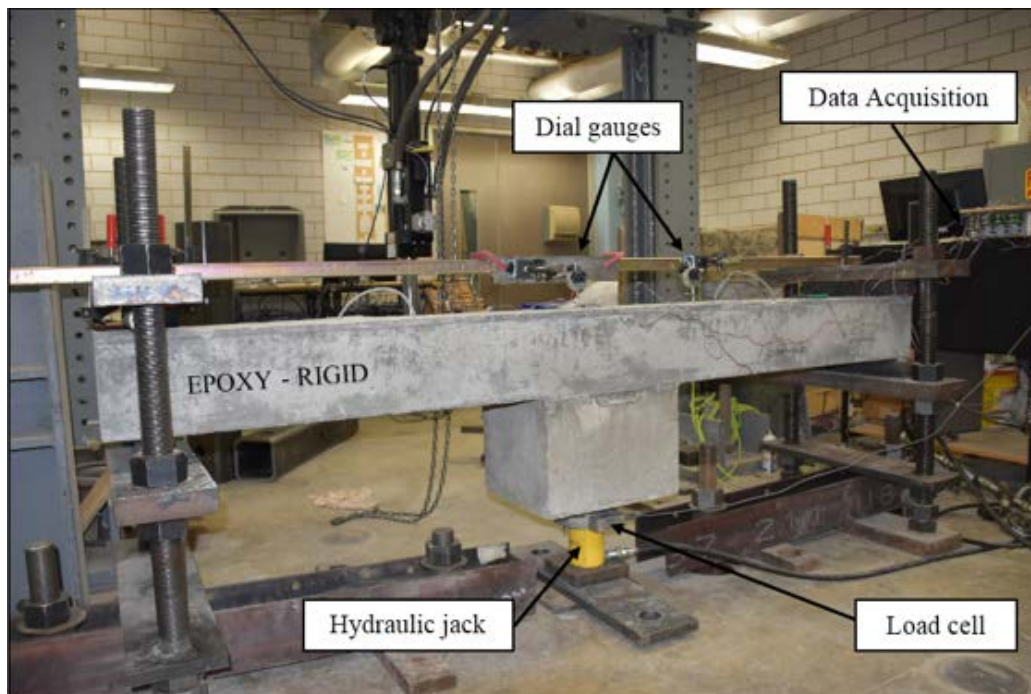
Typical Testing of Slab with Rigid Connection Type
